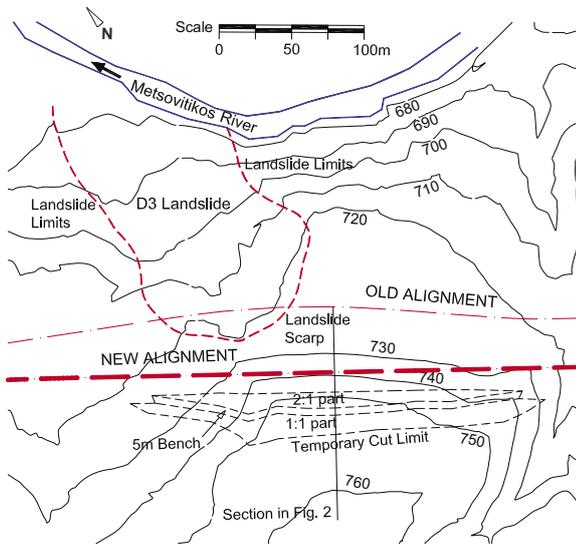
Plan of D3 landslide area, old and new Egnatia alignment and initial cut limits.
